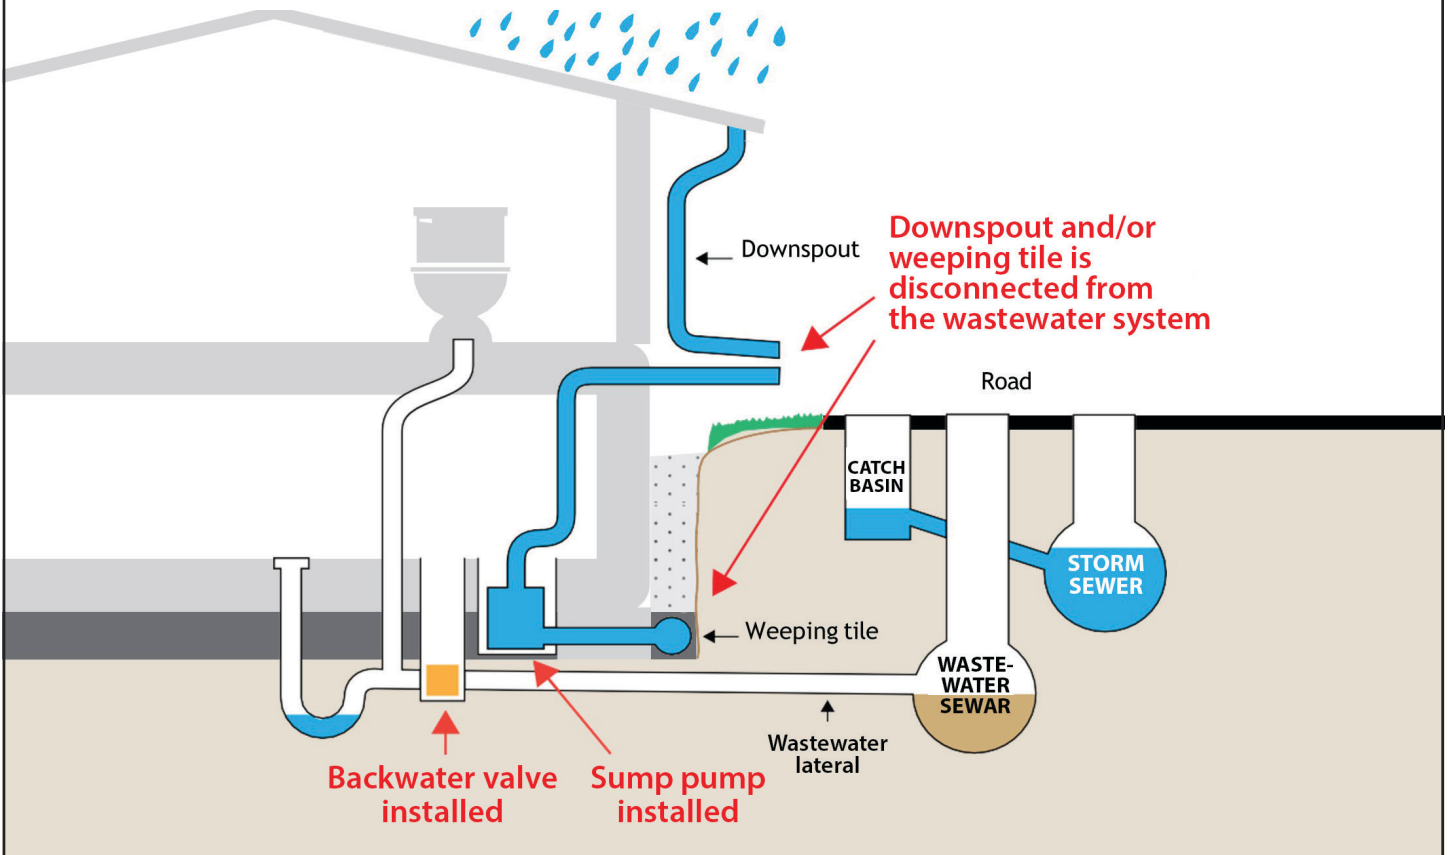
How disconnecting these connections and installing basement flooding prevention devices can reduce basement flooding risk.
